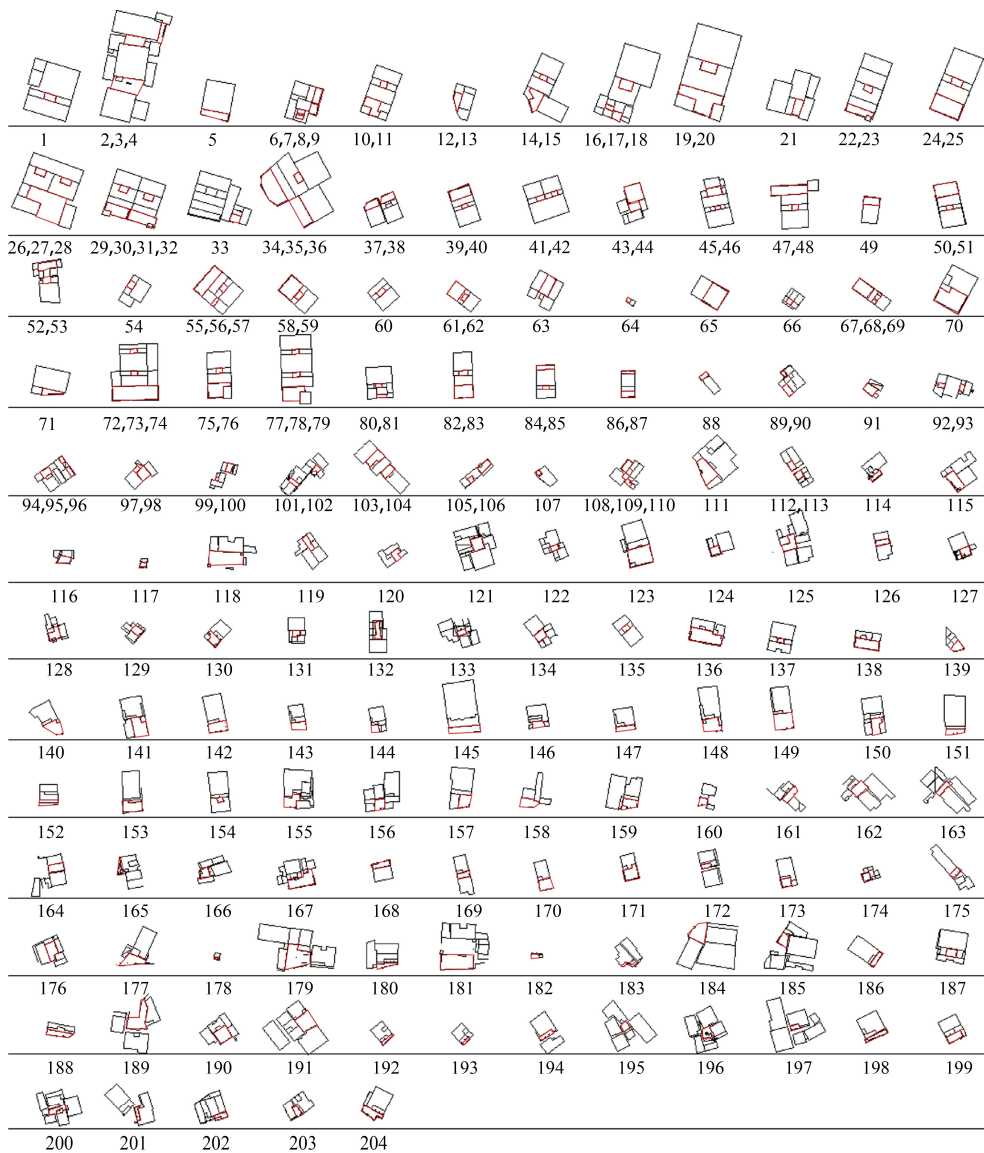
Layout plan of 204 courtyard spaces in traditional villages.
